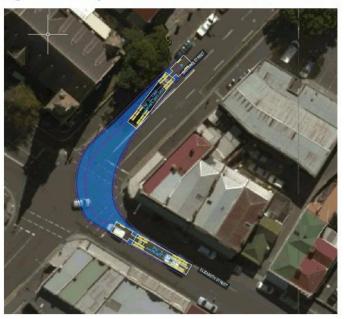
Turn path assessment Elizabeth Street into Brisbane Street
